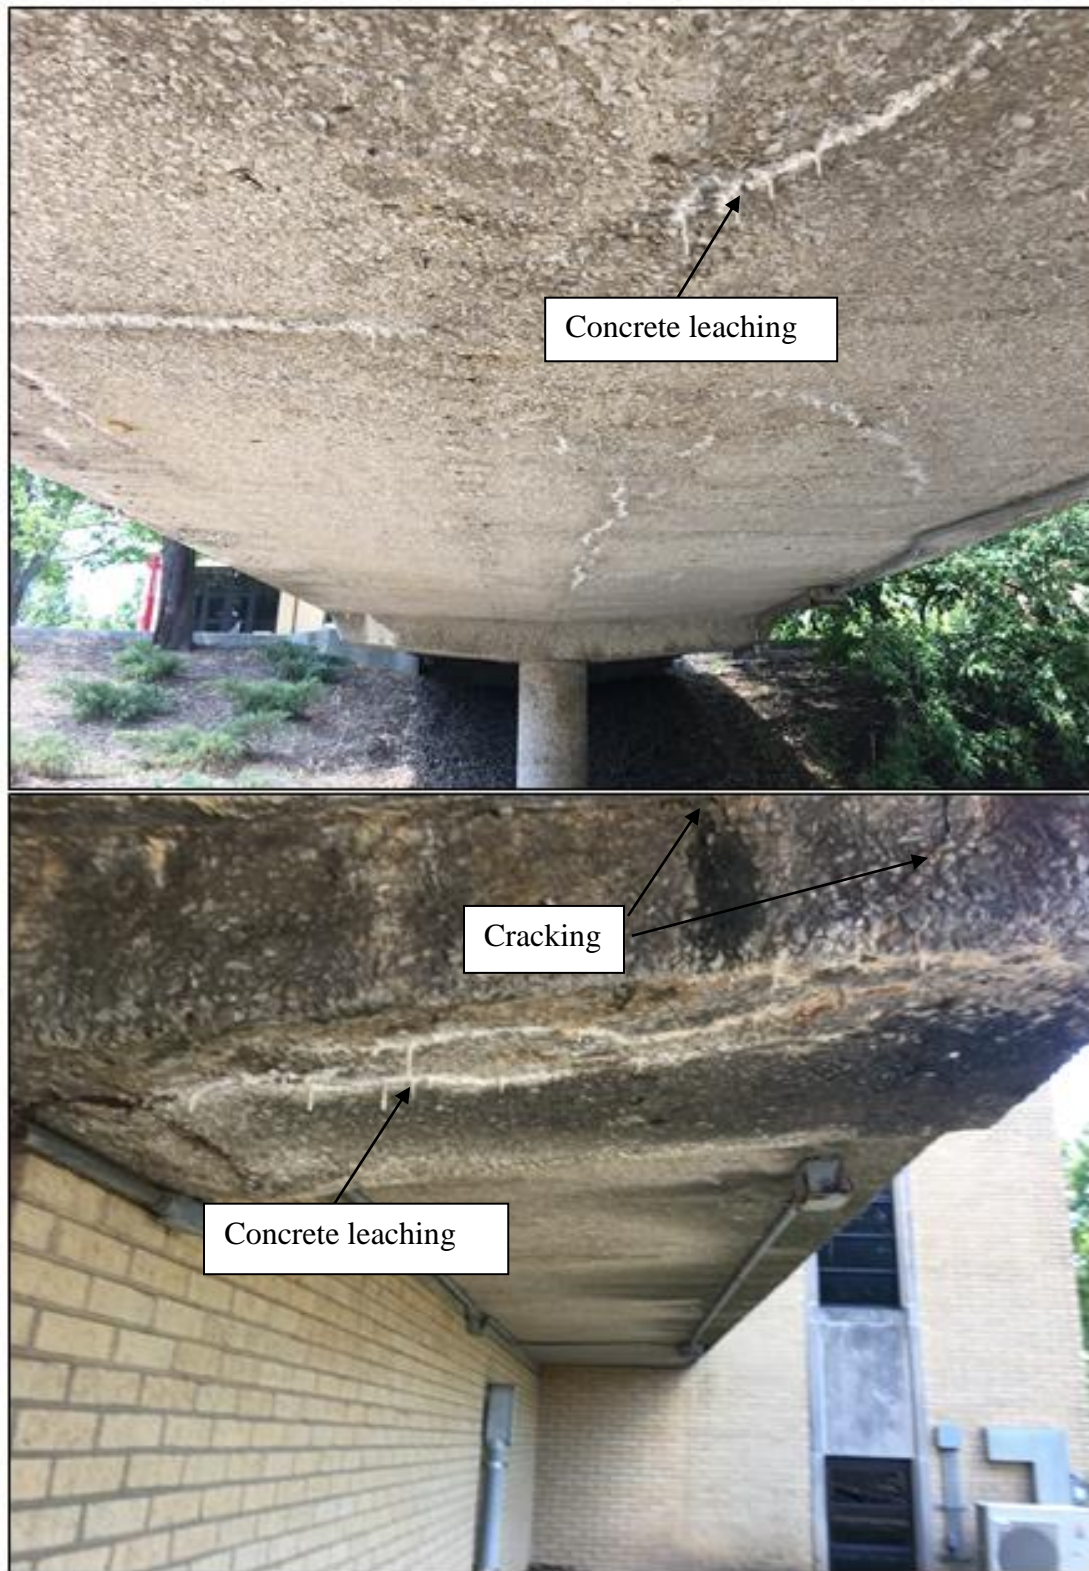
Concrete leaching and cracking at the bottom surface of the bridge deck.
